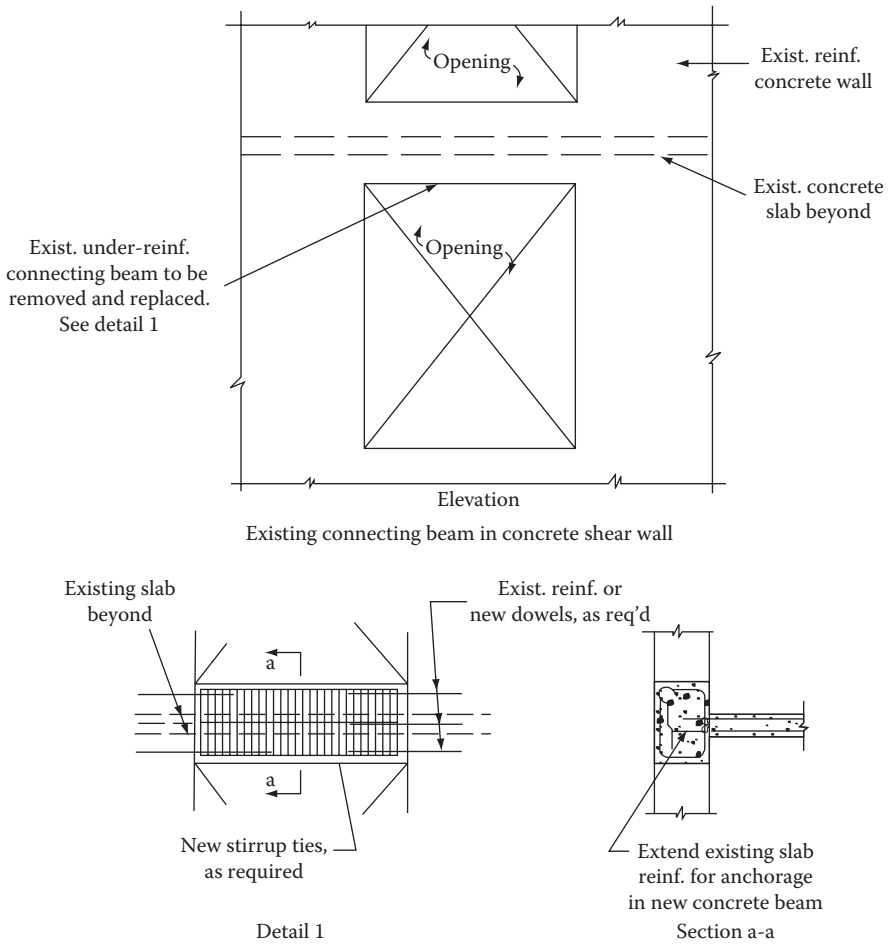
Strengthening of existing connection beams in reinforced concrete walls.
